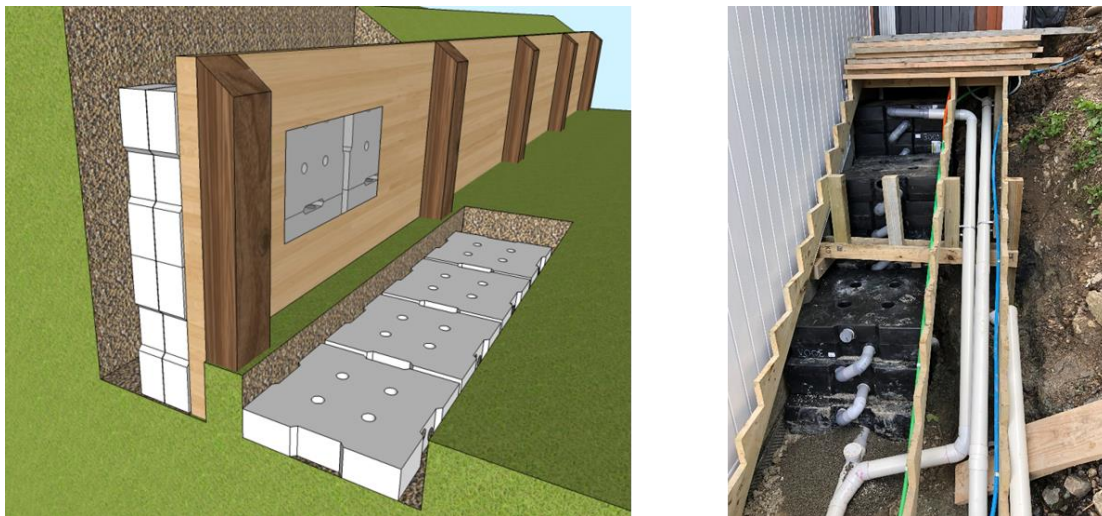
Left: The Aquacomb modular pods installed behind retaining wall. Right: Under the stairs in steep site.
